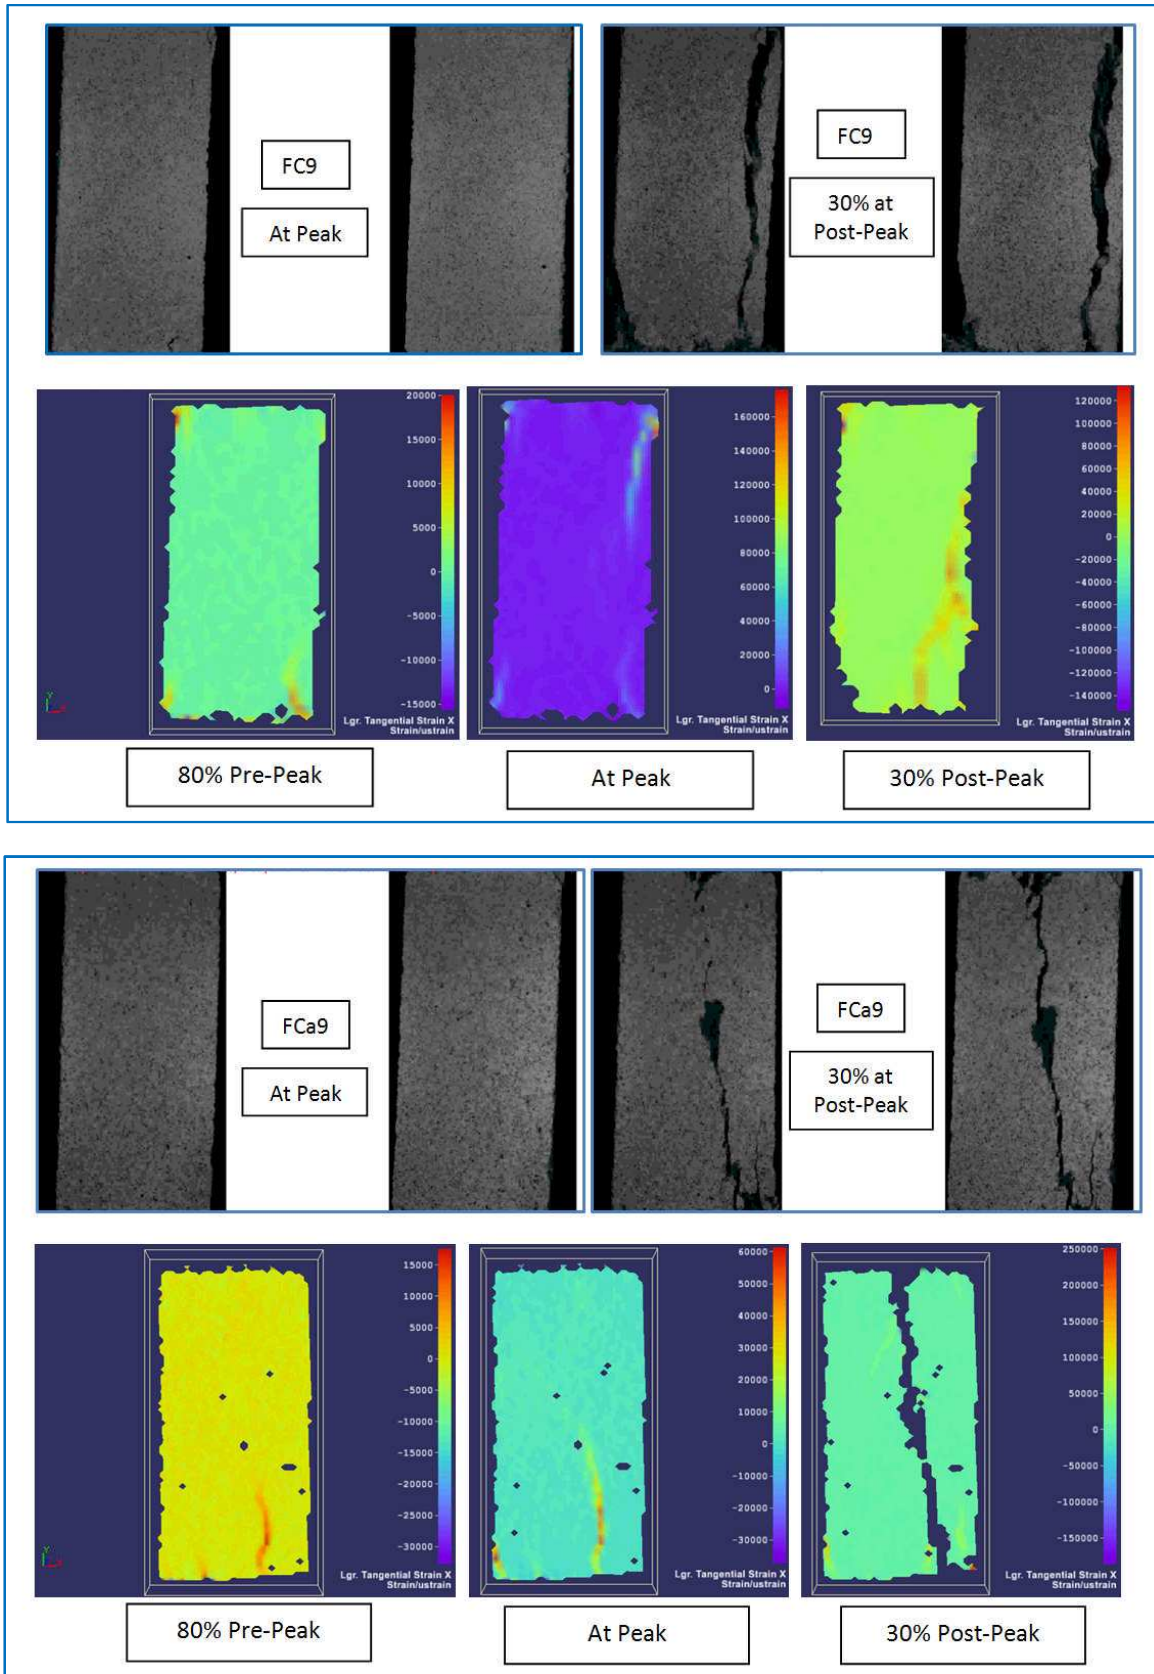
continued: Cracks in selected foamed concrete specimens at different loading stages
